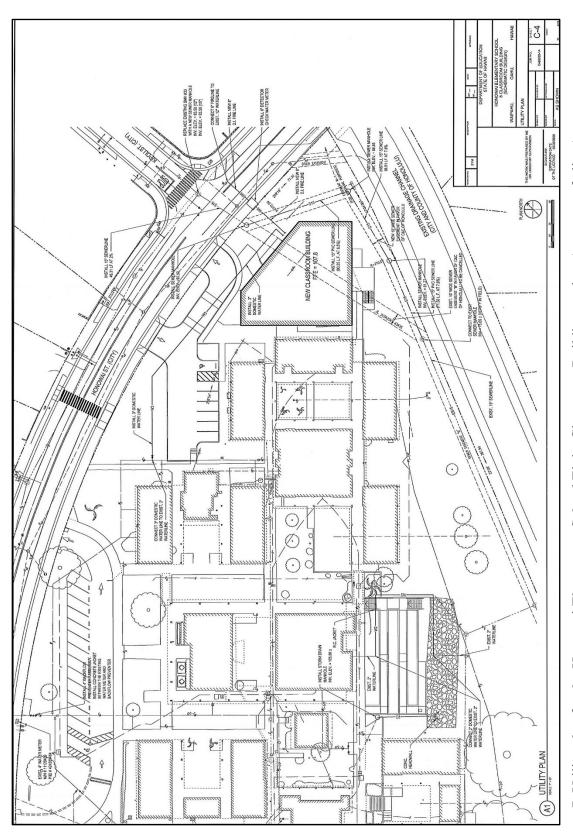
Utility plan for the Honowai Elementary School Eight-Classroom Building project (courtesy of client)
